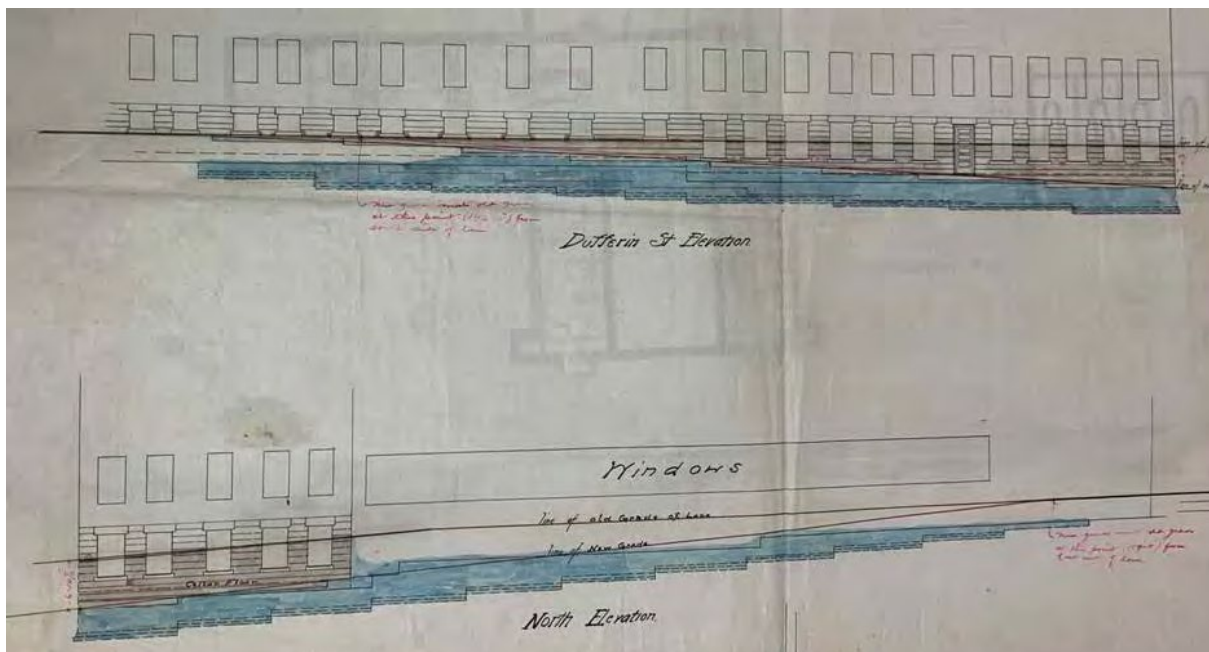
1897 original drawing by EJ Lennox showing the underpinning necessary to accommodate the grade change for the Queen Street underpass. This grade change would result in the building at 366-370 Dufferin Street effectively gaining an additional storey by digging down to expose the basement level. (EJ Lennox Fonds, Archives of Ontario)
